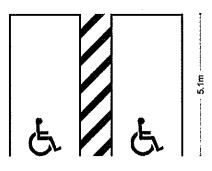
Parking Lot Stall, Aisle and Parking Bay Dimensions
